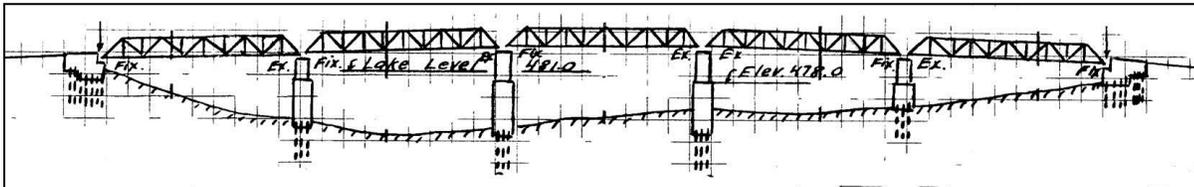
Belmont-Tilton 072/148, Winnisquam Bridge (1916). Field inspection elevation sketch made June 13, 1940 (NHHD Bridge Inventory Card)
